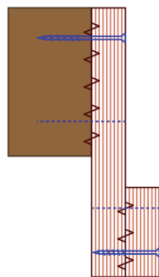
Schematic of the combined cross-section of the top rail of the wall elements of Test Series 2.
